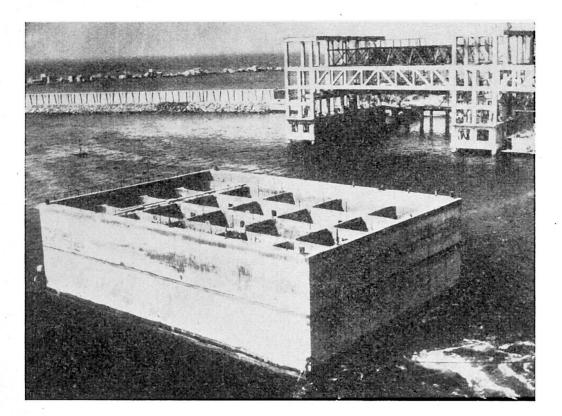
Airport dam and pier at Genoa. Floating caissons and precasting equipment (Impresa Fincosit).
